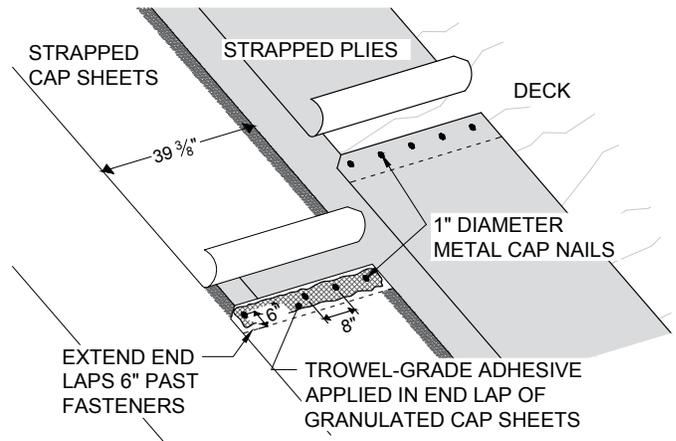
Construction of T-Joints at End Laps in Strapped Installations
